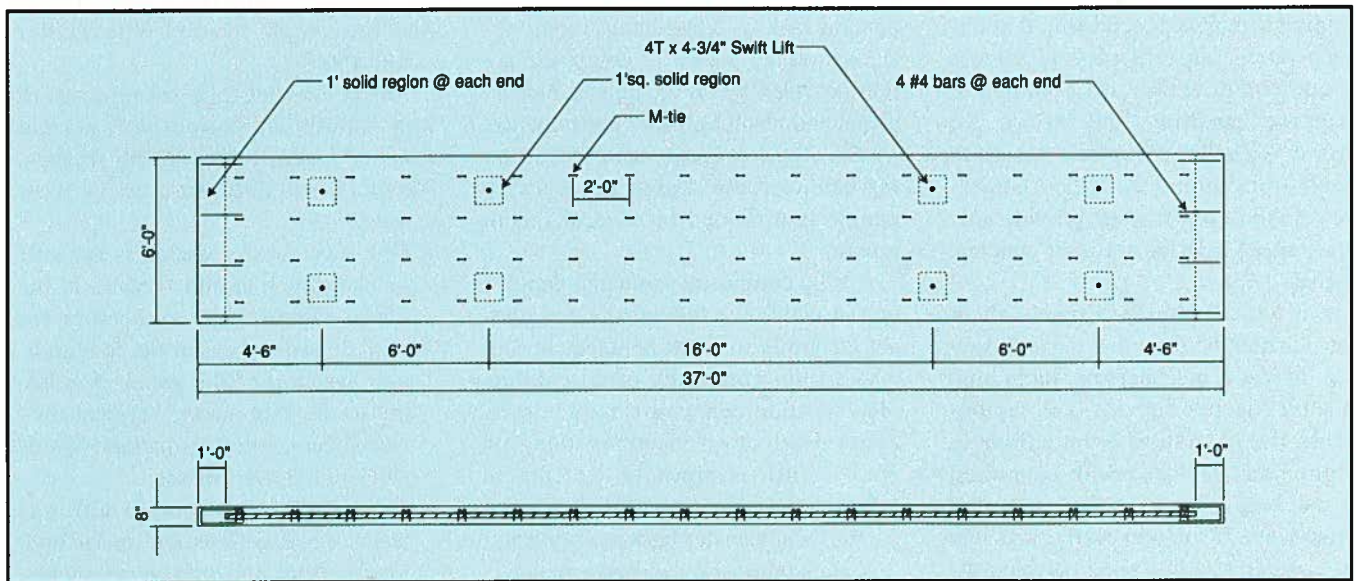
Plan view and longitudinal section of Panel 1 (Note: 1 in. = 25.4 mm; 1 ft = 0.3048 m).
